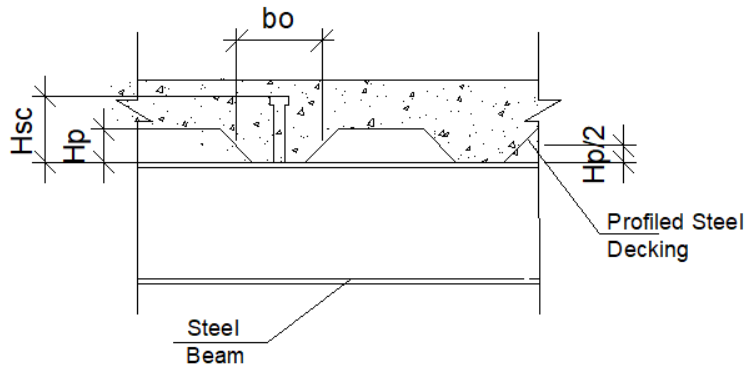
Composite Beam with profiled steel sheeting transverse to the beam according to EN
